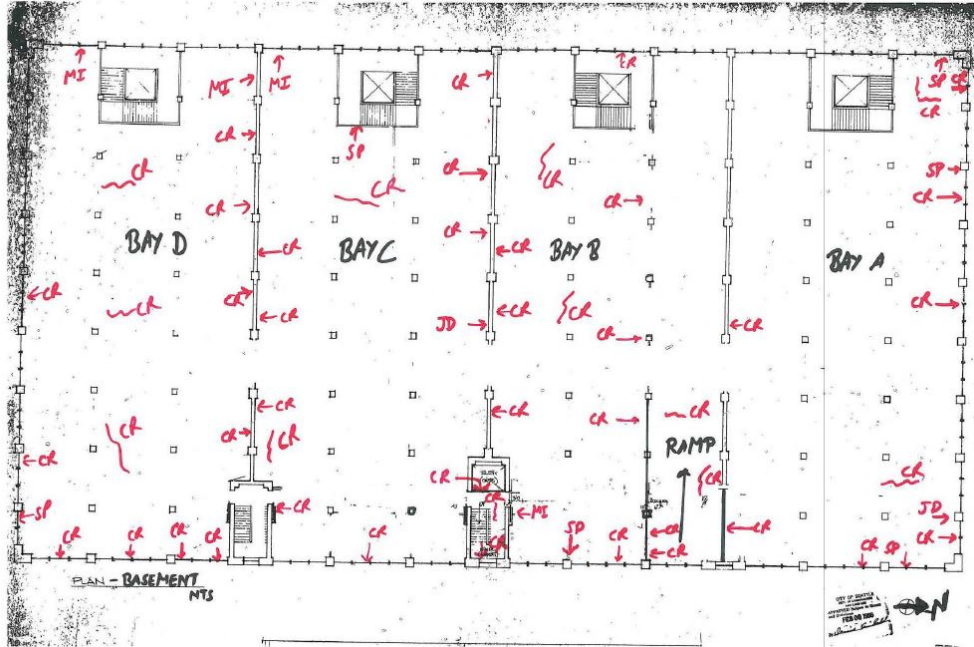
Floor plan of a building published by the WSDOT’s pre-construction survey
